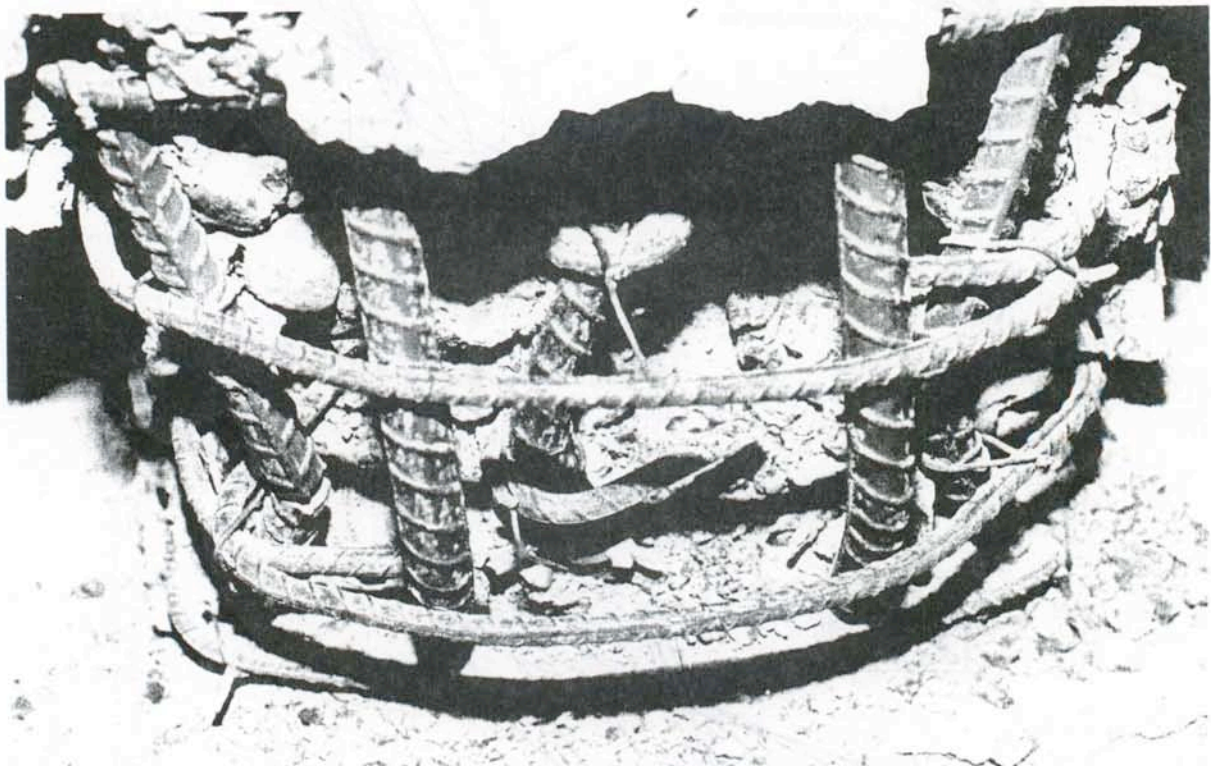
Buckling of the longitudinal reinforcement in Column 6.
